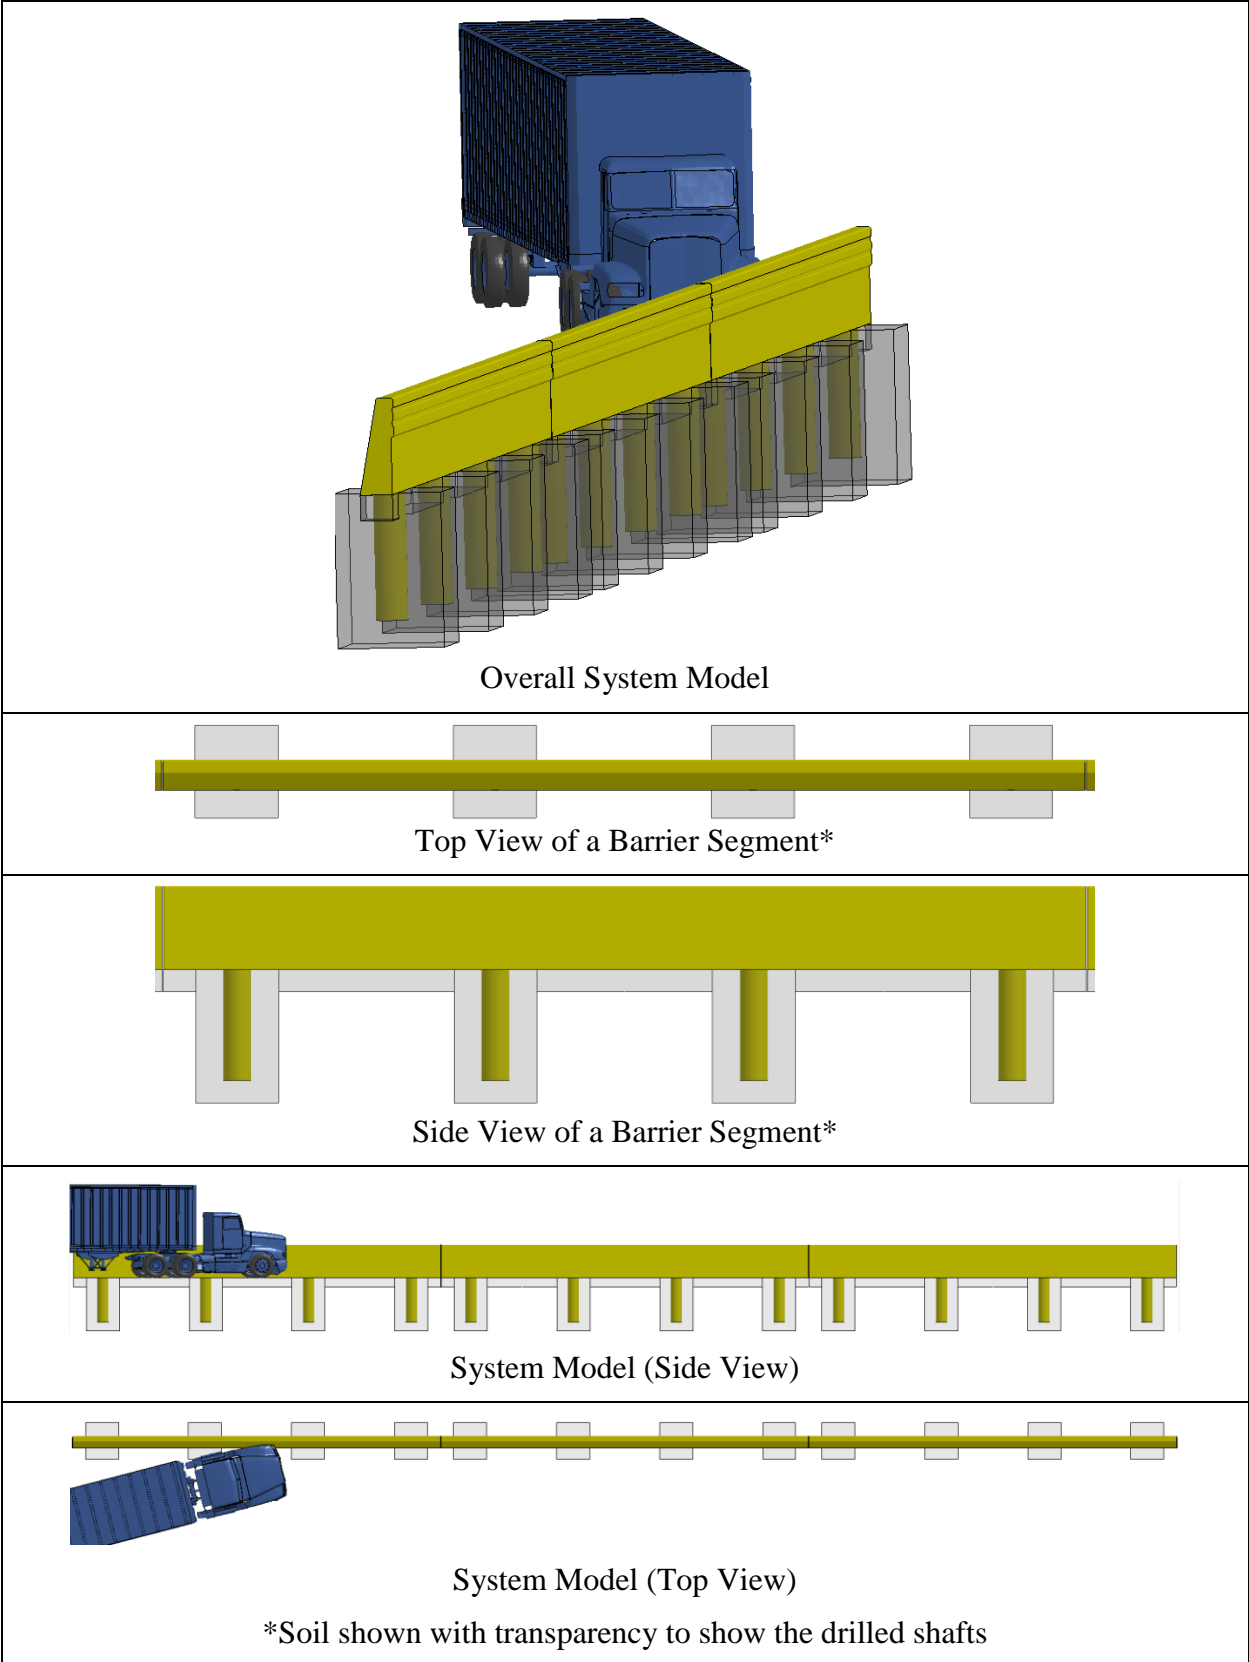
Optimized Drilled Shaft Foundation Model Details with 6ft Deep Shafts
